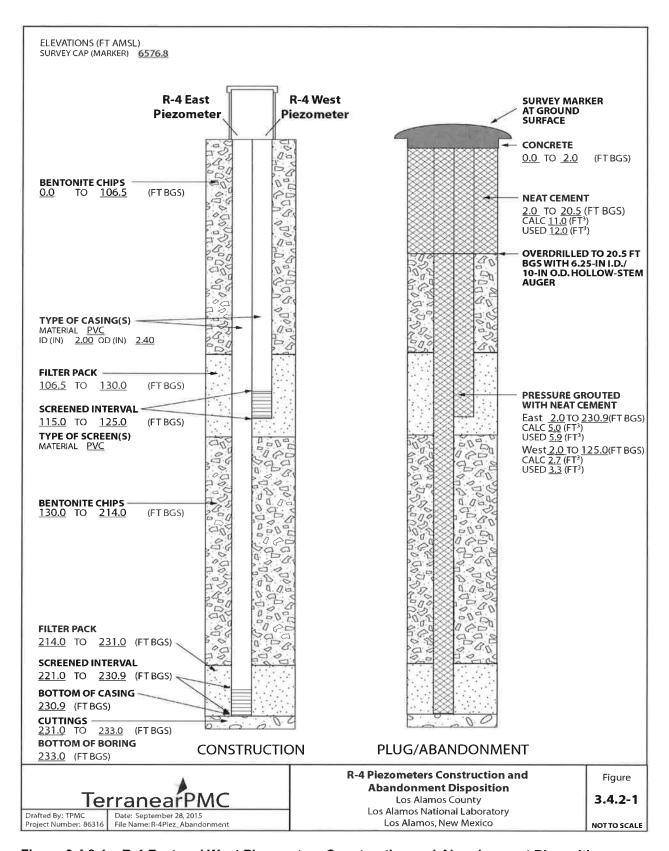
R-4 East and West Piezometers Construction and Abandonment Disposition
